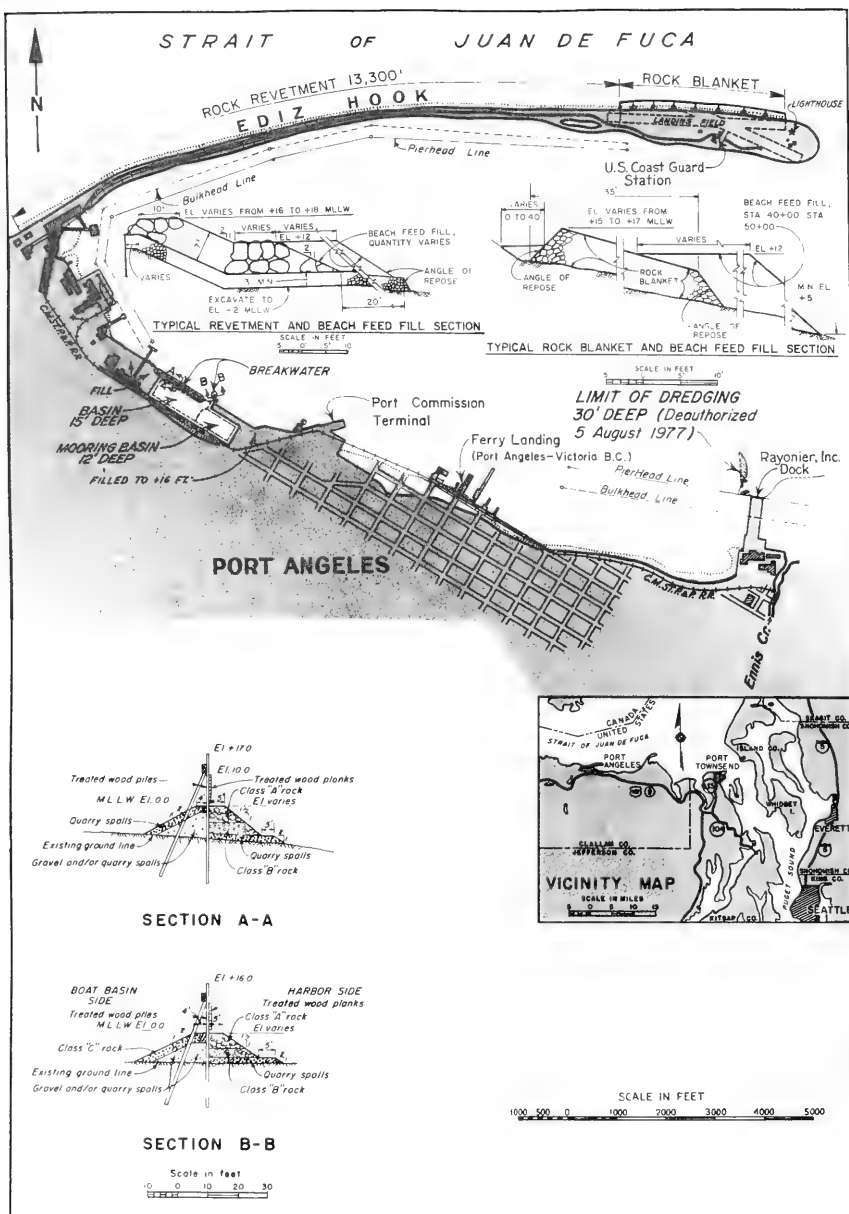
Site layout of Port Angeles, and Ediz Hook, Washington (revised 1979)
